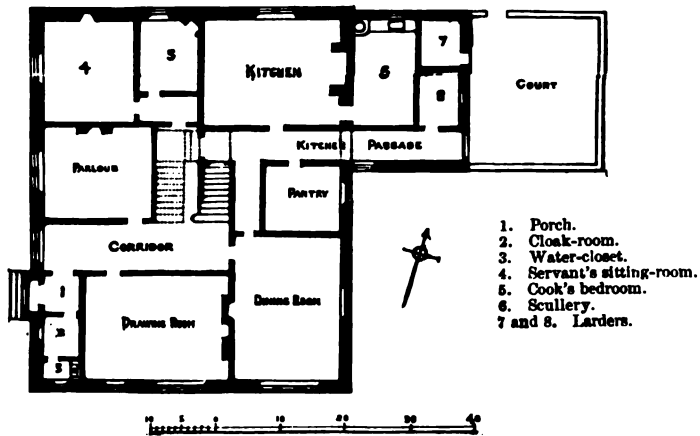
PLAN B.—HOUSE WITH ENTRANCE ON WEST SIDE.
